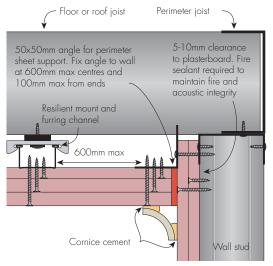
Fire Rated Ceiling to Wall Resilient mount and furring channel
